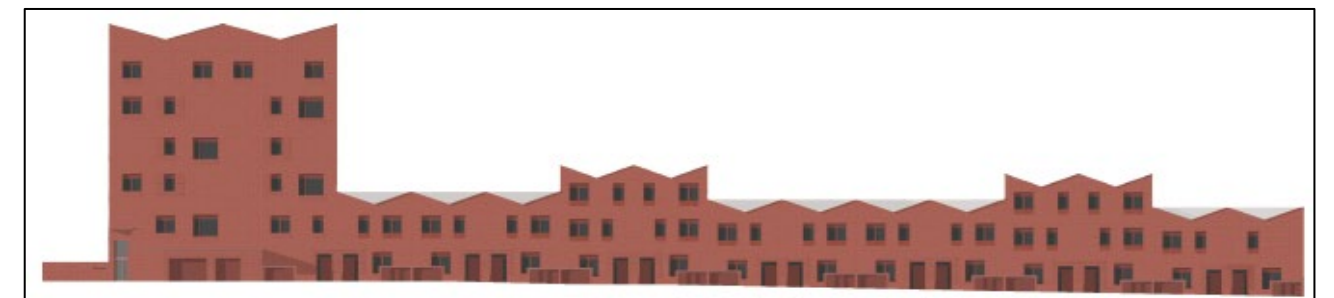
Façade Design Building Plot H3 (East Elevation)
